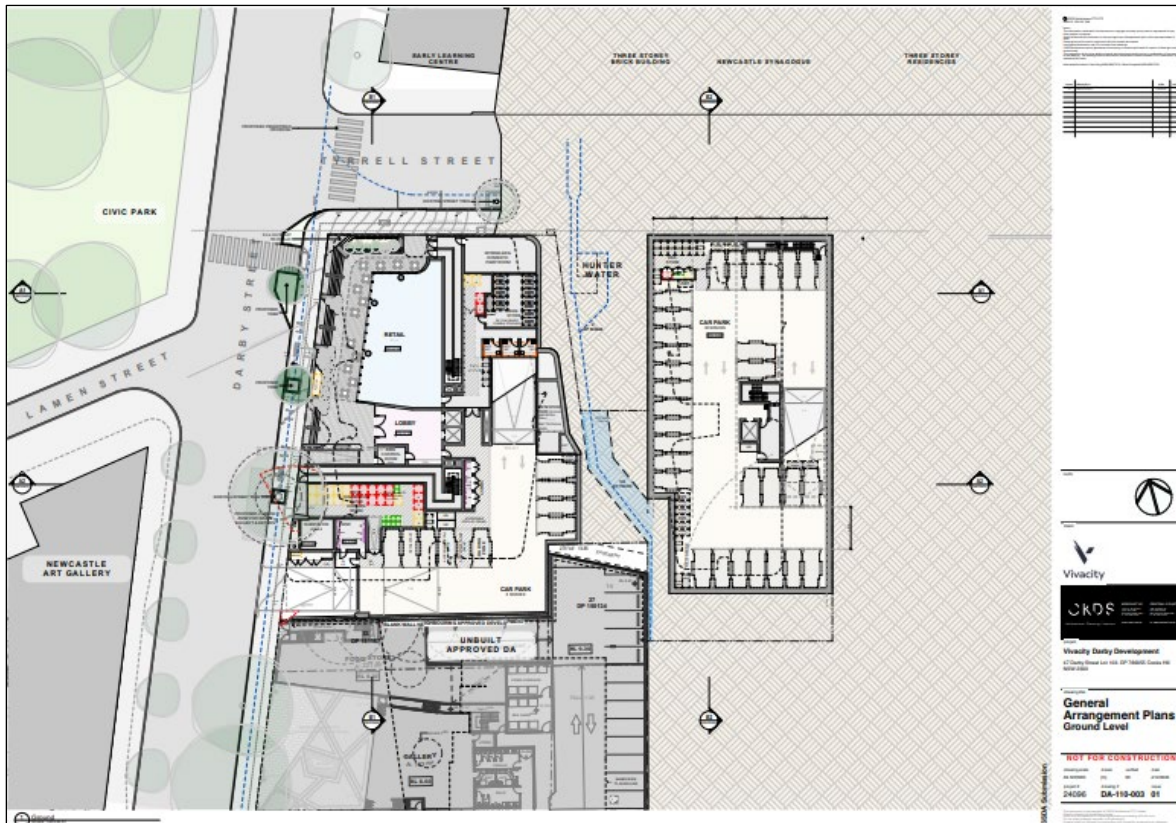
Ground Floor Darby Street Building. Source: CKDS December 2025
